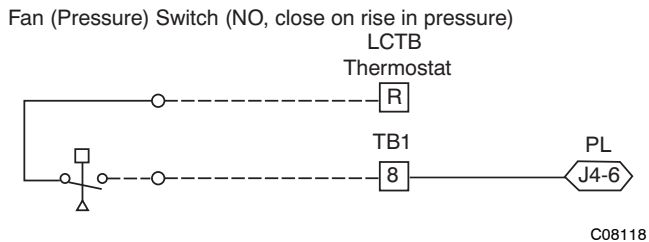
PremierLink Wiring Fan Pressure Switch Connection
